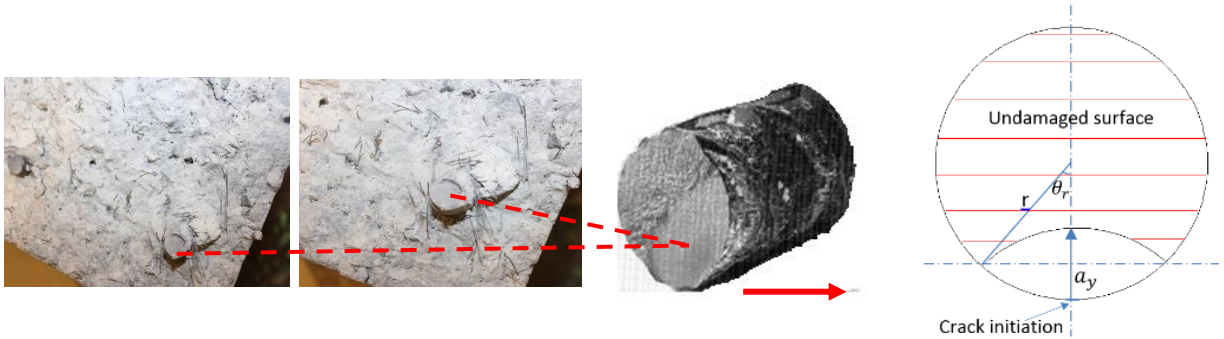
Crack growth on a reinforcing bar cross section.
